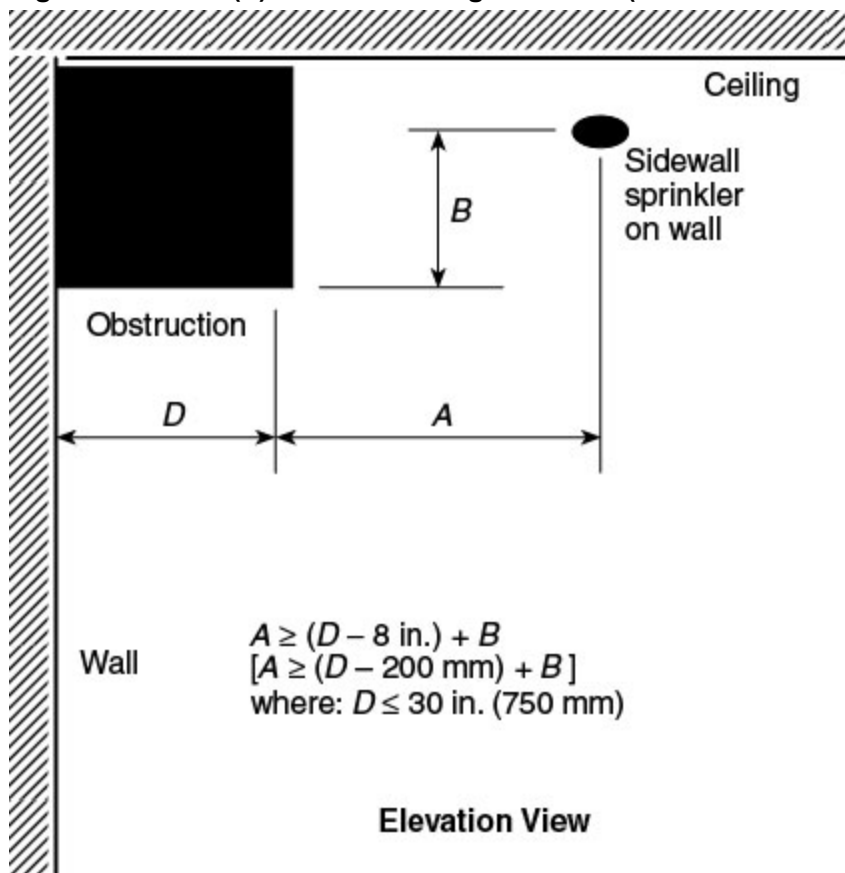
(c) Obstruction Against Wall (Extended Coverage Sidewall Spray Sprinklers).
